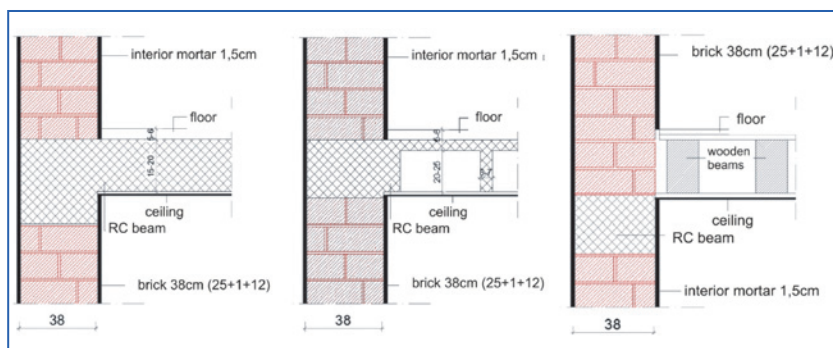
Floor structures: a) monolithic RC; b) semi-prefabricated system "Avramenko"; c) wooden floor.
